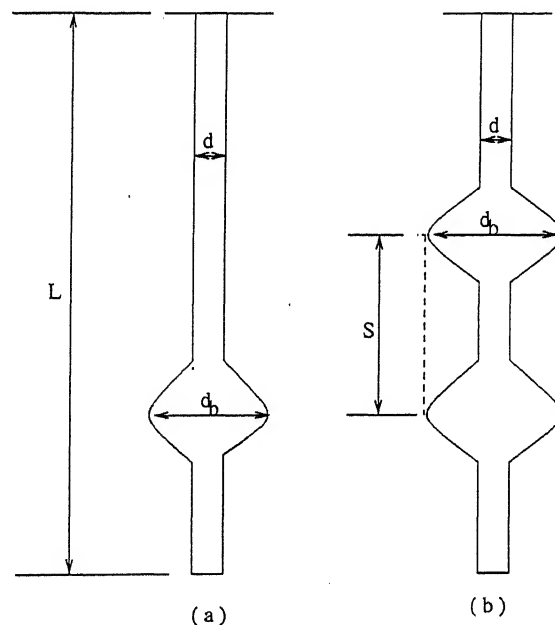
Under-reamed Piles (a) Single and (b) Double Bulb Under-reams.
